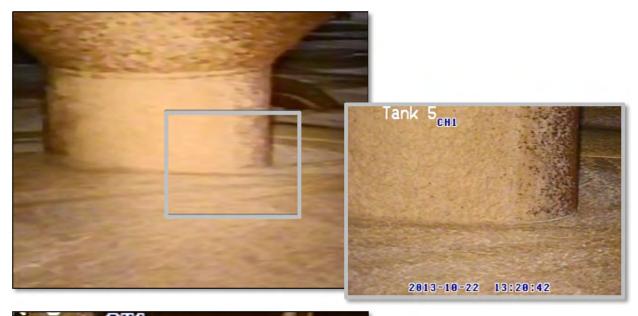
Bulk Fill Grout in Tank 5 during the Filling Process (Lift 4)
